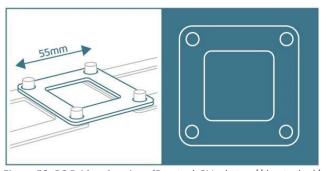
DS Bridge drawings (Drystack BV < https://drystack.nl/>)
